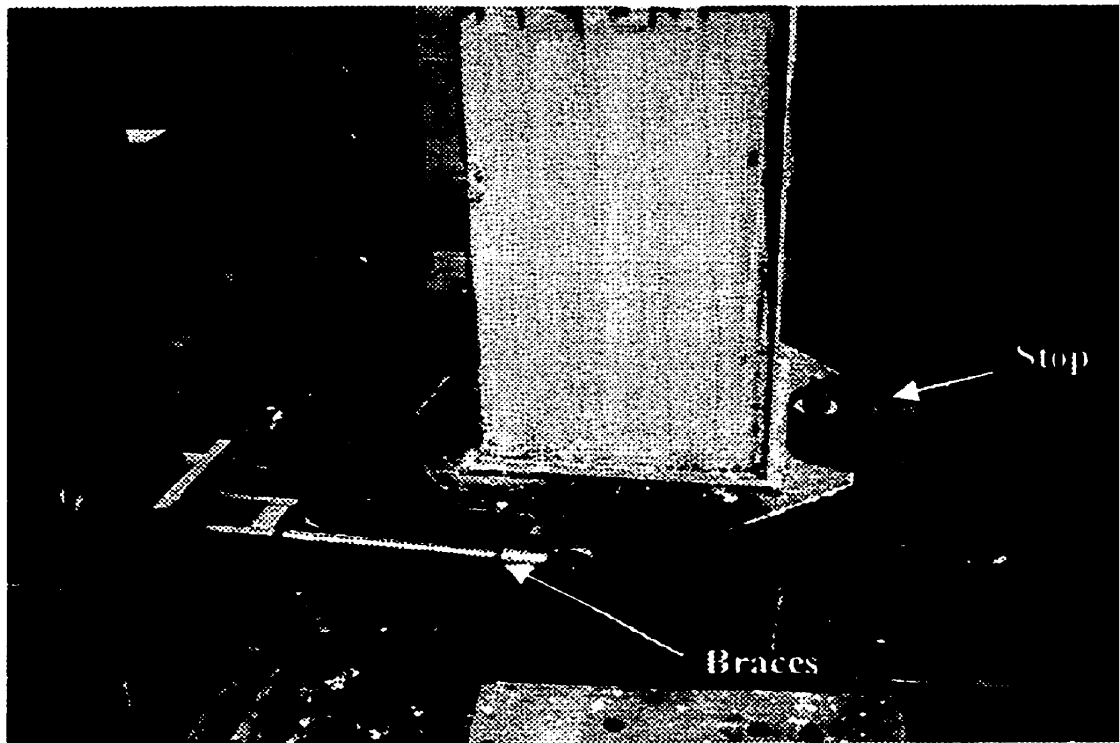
Column Bracing: Horizontal Forces Taken into Test Frame
